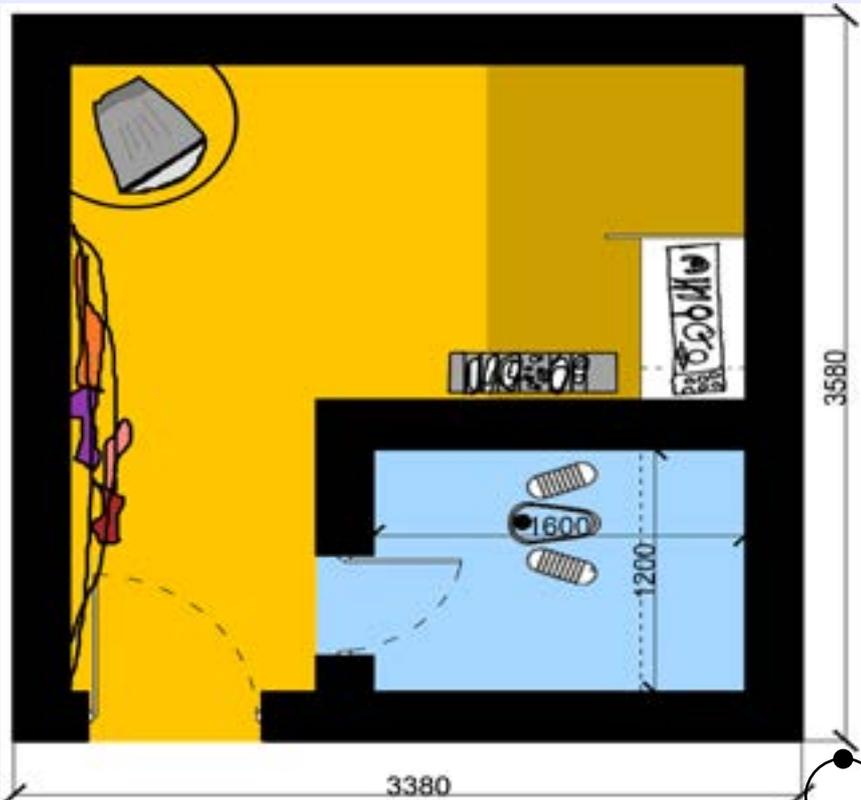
Plan of House No. 416 at Vijay Nagar, Thane.
